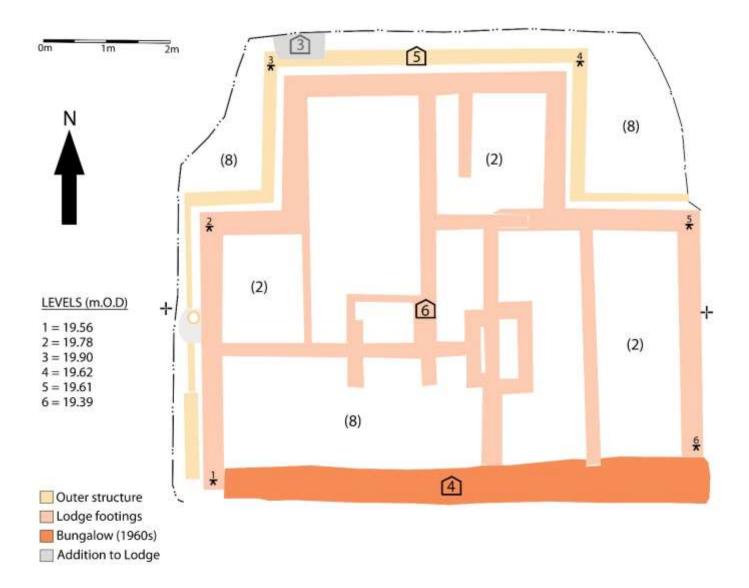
Plan of the excavated foundations for the Lodge building. Scale 1:20
